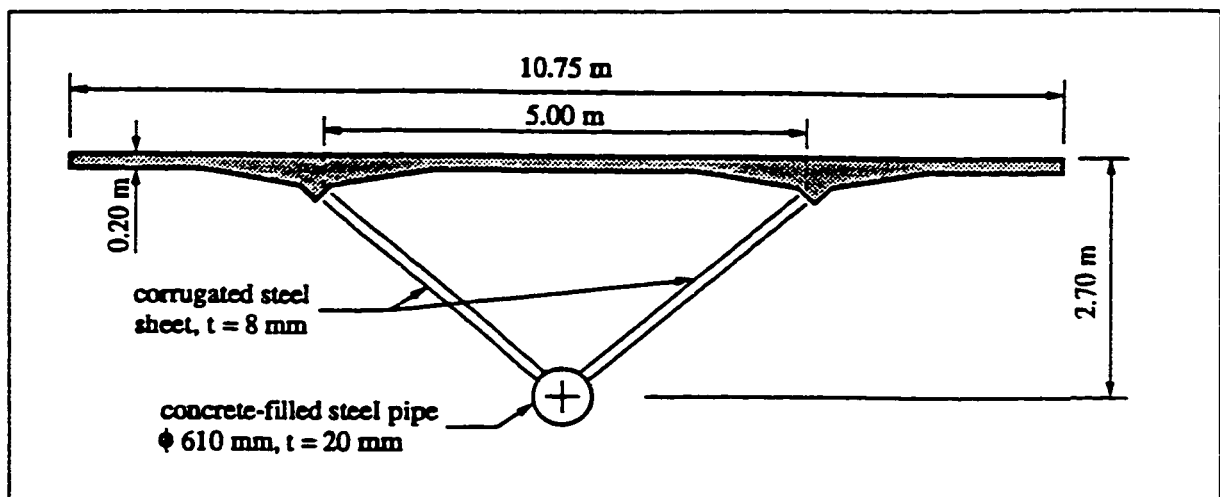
Maupre Viaduct - Typical mid-span cross section, [ref. 6,20]
